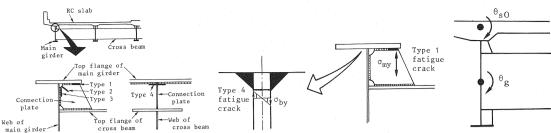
Fatigue cracks at cross-beam connection of plate girder bridge.
